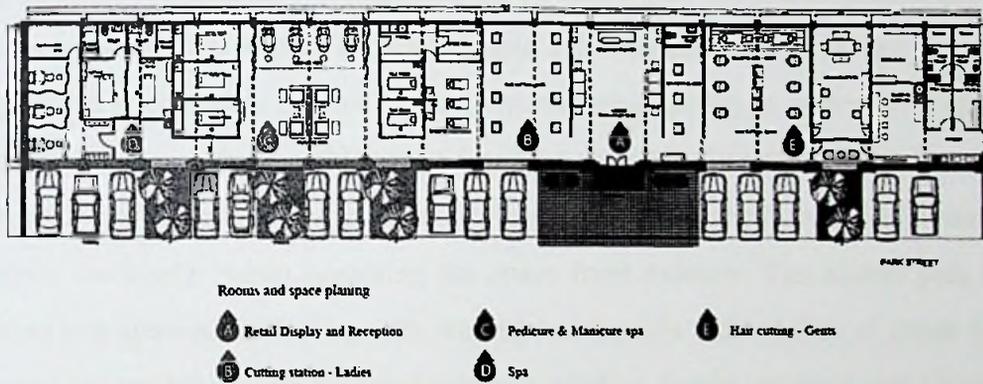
Crown Hair and Beauty, Spa and Salon – Space plan and furniture layout.
